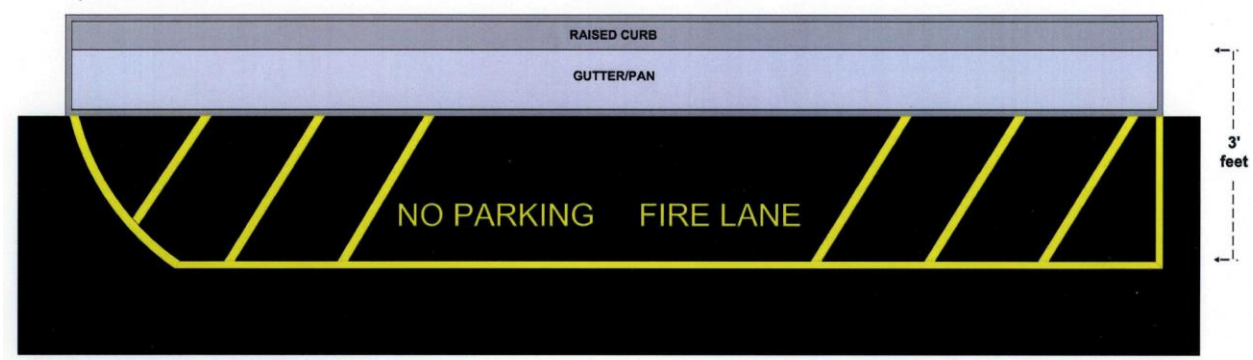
Fire Lane Curb Marking
